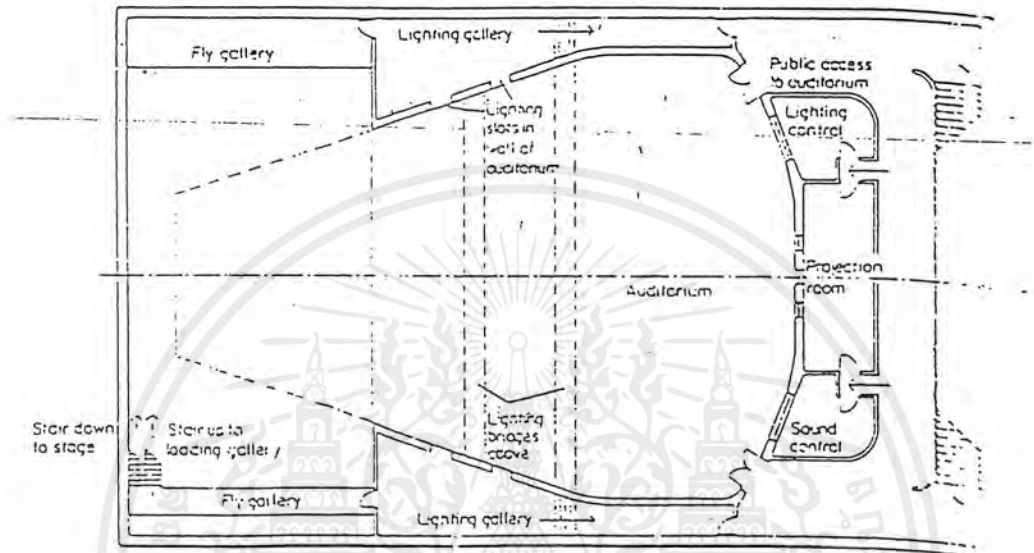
Typical arrangement of control rooms and lighting galleries
